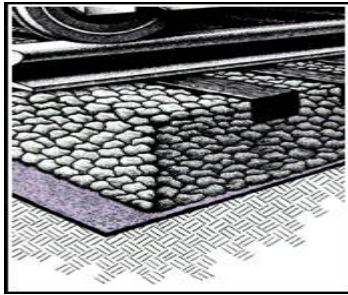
c Geotextile sheet used as reinforcement in railway road
